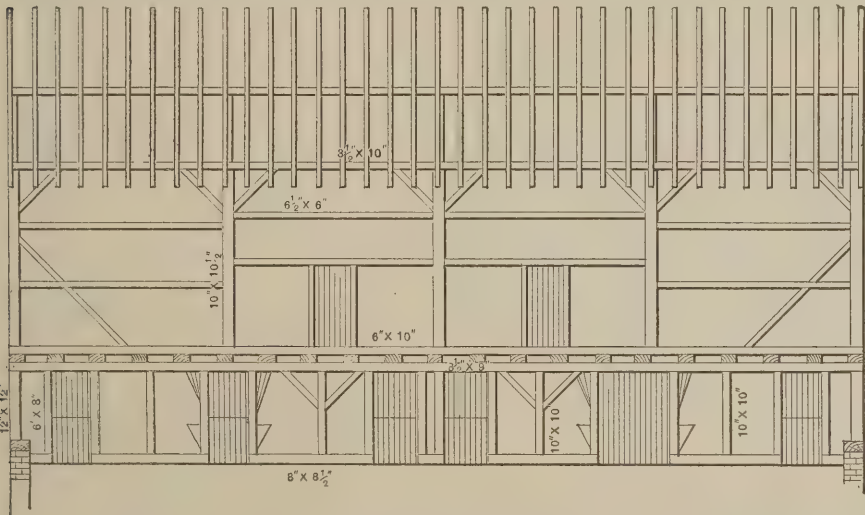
Constructing an Elevation by the Method Last Explained.
